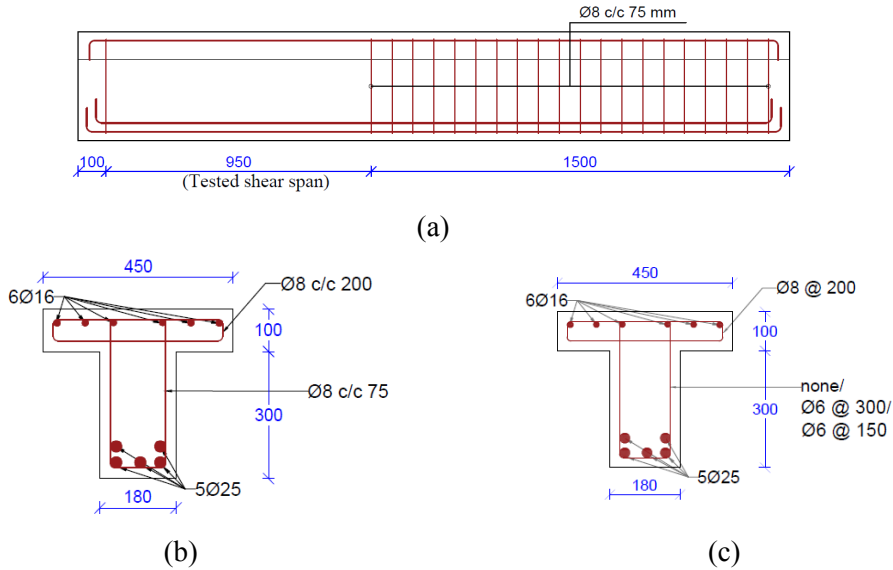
Reinforcement details and geometry of the test beams: (a) longitudinal detail, (b) cross-sectional detail outside the CSS, and (c) cross-sectional detail within the CSS. (Dimensions: mm)
